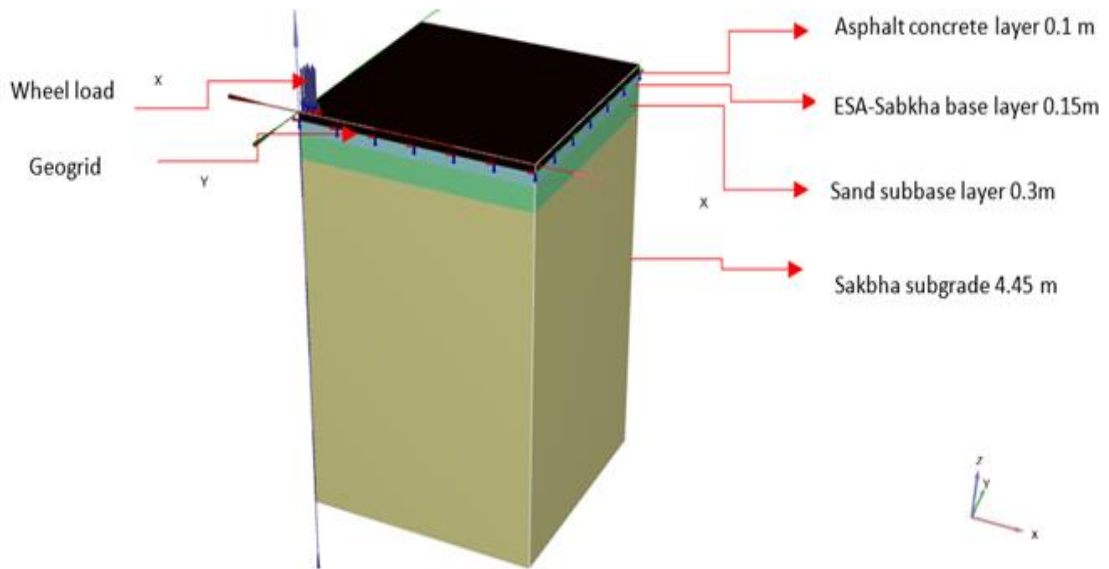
Axisymmetric finite element modeling of a geogrid-reinforced pavement structure at the top of stabilized ESA-sabkha base layer
